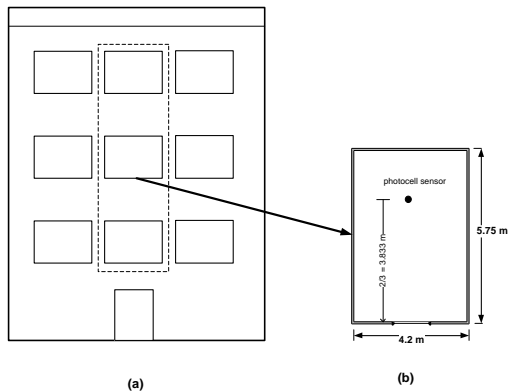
Schematic of the house showing the representative rooms. (a) Front view of the house (b) Plan view of mid-floor bedroom.
